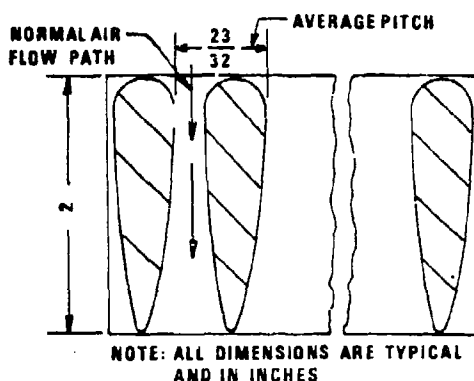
Venturi Type Louver Bar Grille Assembly (Ref. 2)
